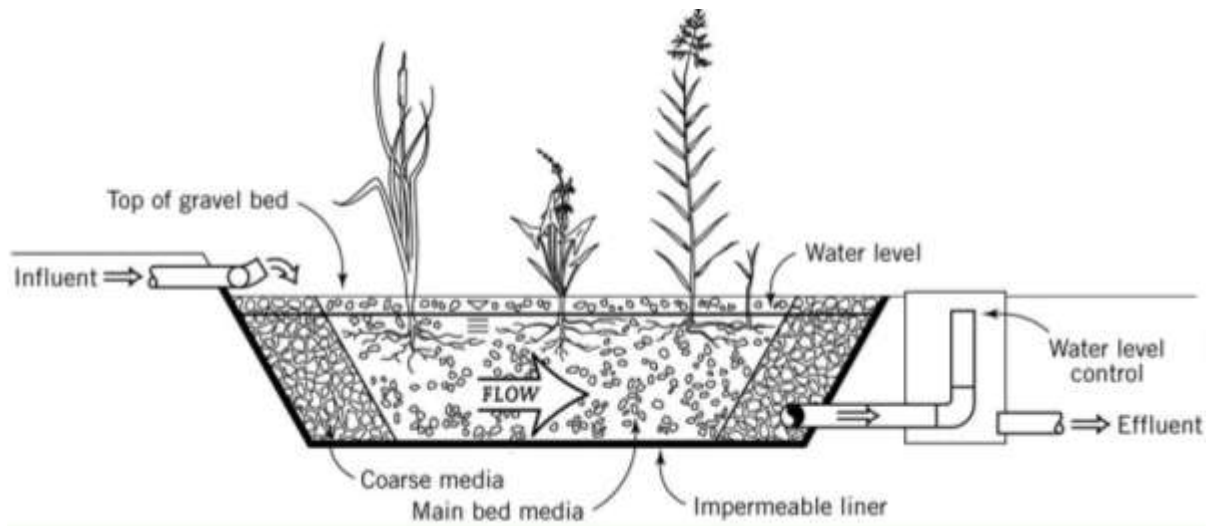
Section view of a Horizontal Sub-surface Flow Constructed Wetland
